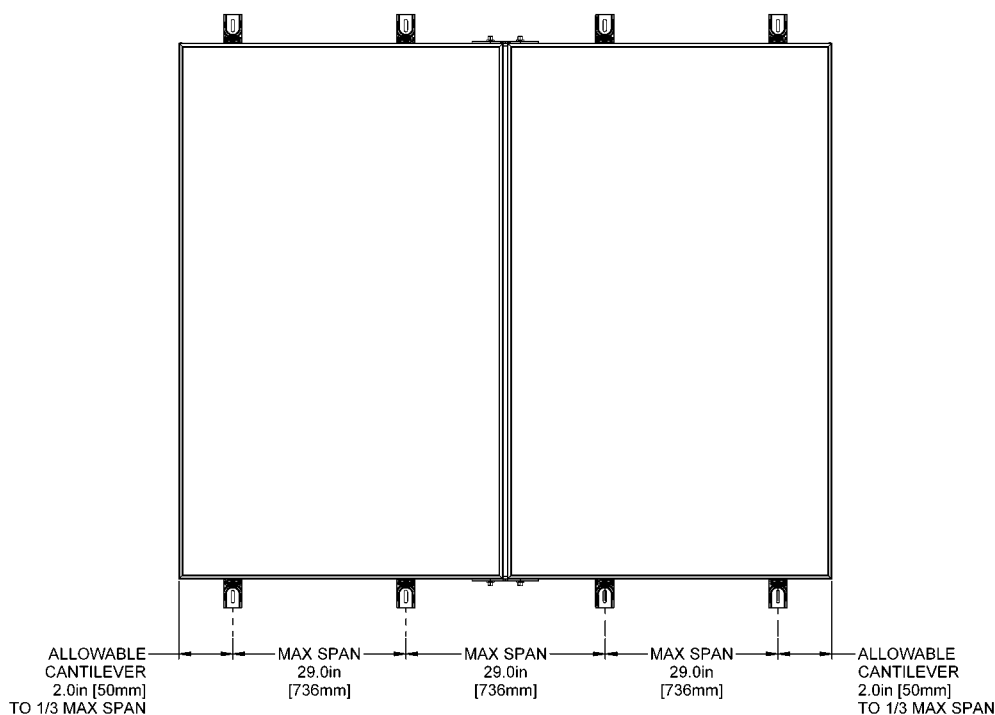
Layout With Cam Feet, Landscape Example, 50 psf (2400 Pa) Design Load
